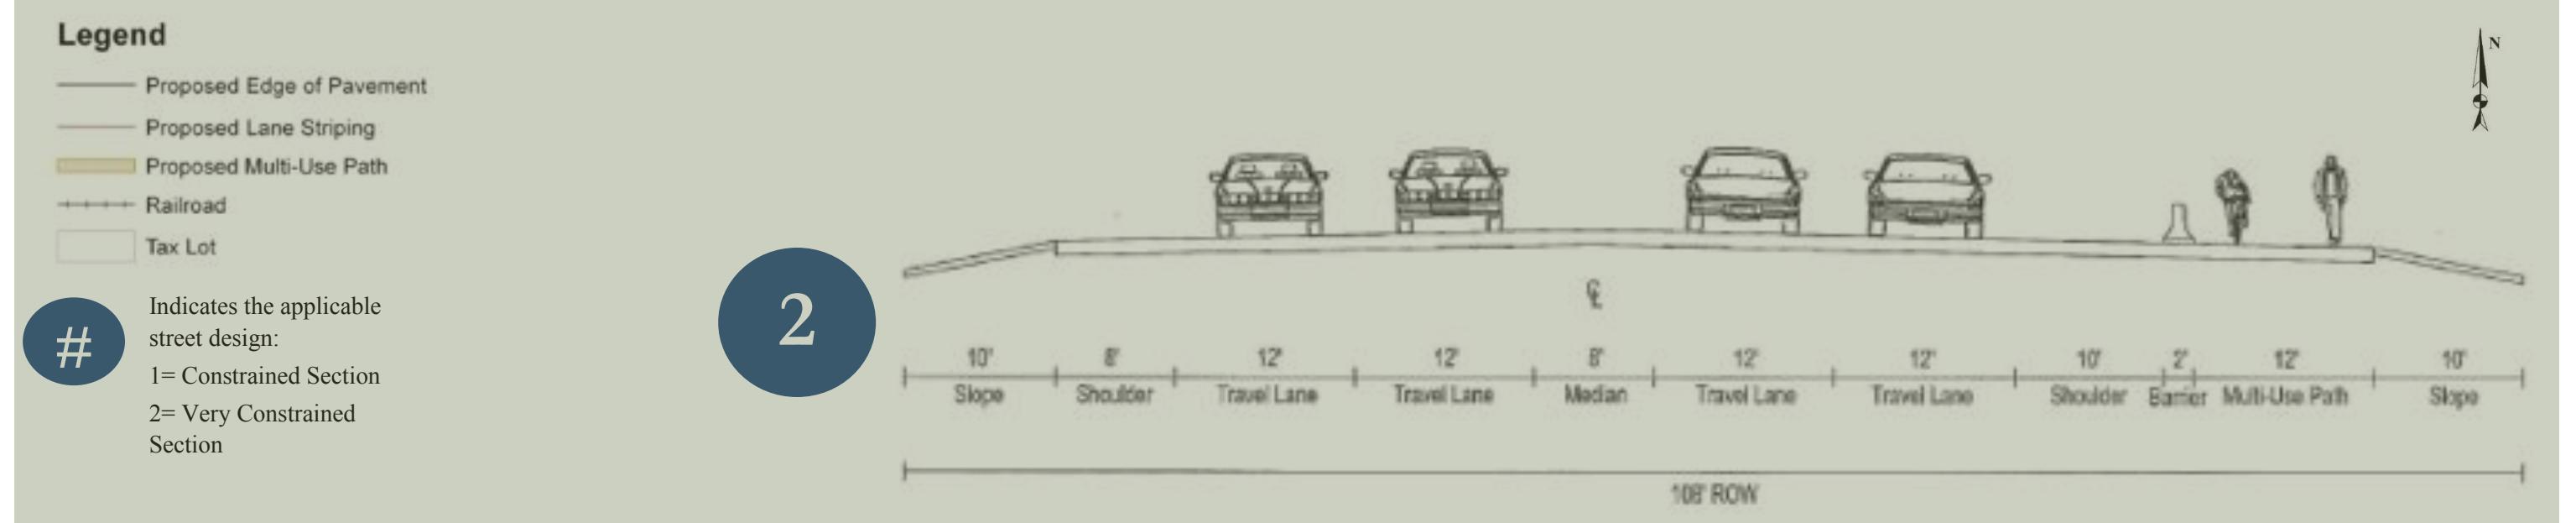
Recommended Corridor Plan: Coyote Creek to west of Fisher Road
